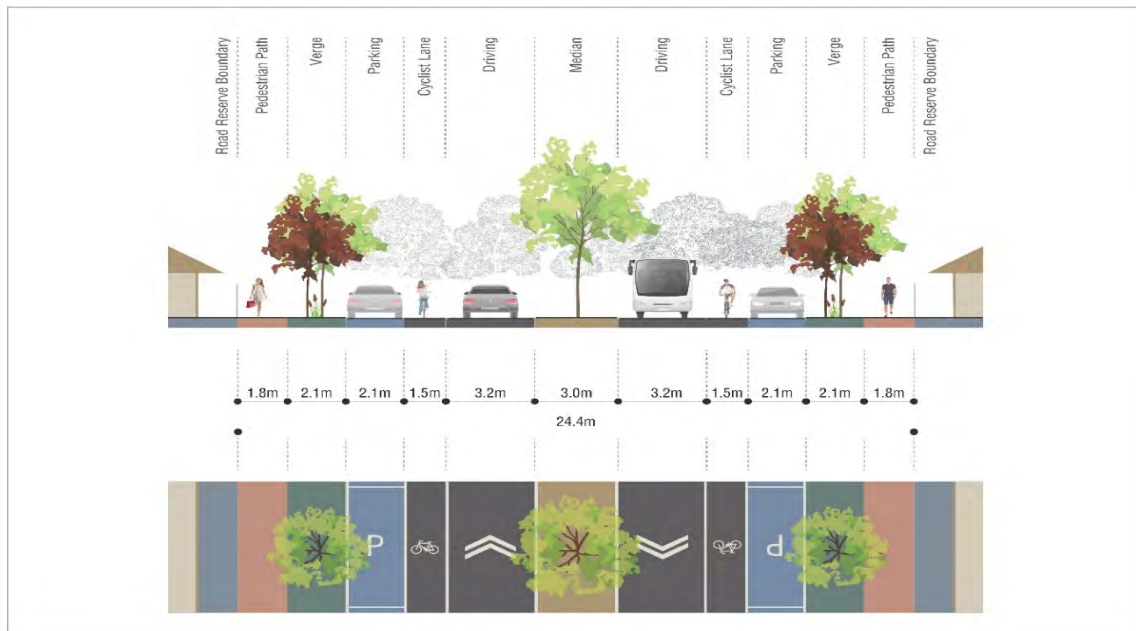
RD14 TOD Connector Boulevard (Milner Road to Enterprise / Ibis), RD15 TOD Connector Boulevard (Milner Road to Brae Road) and RD16 TOD Connector Boulevard (East of Brae Road) Cross Section
